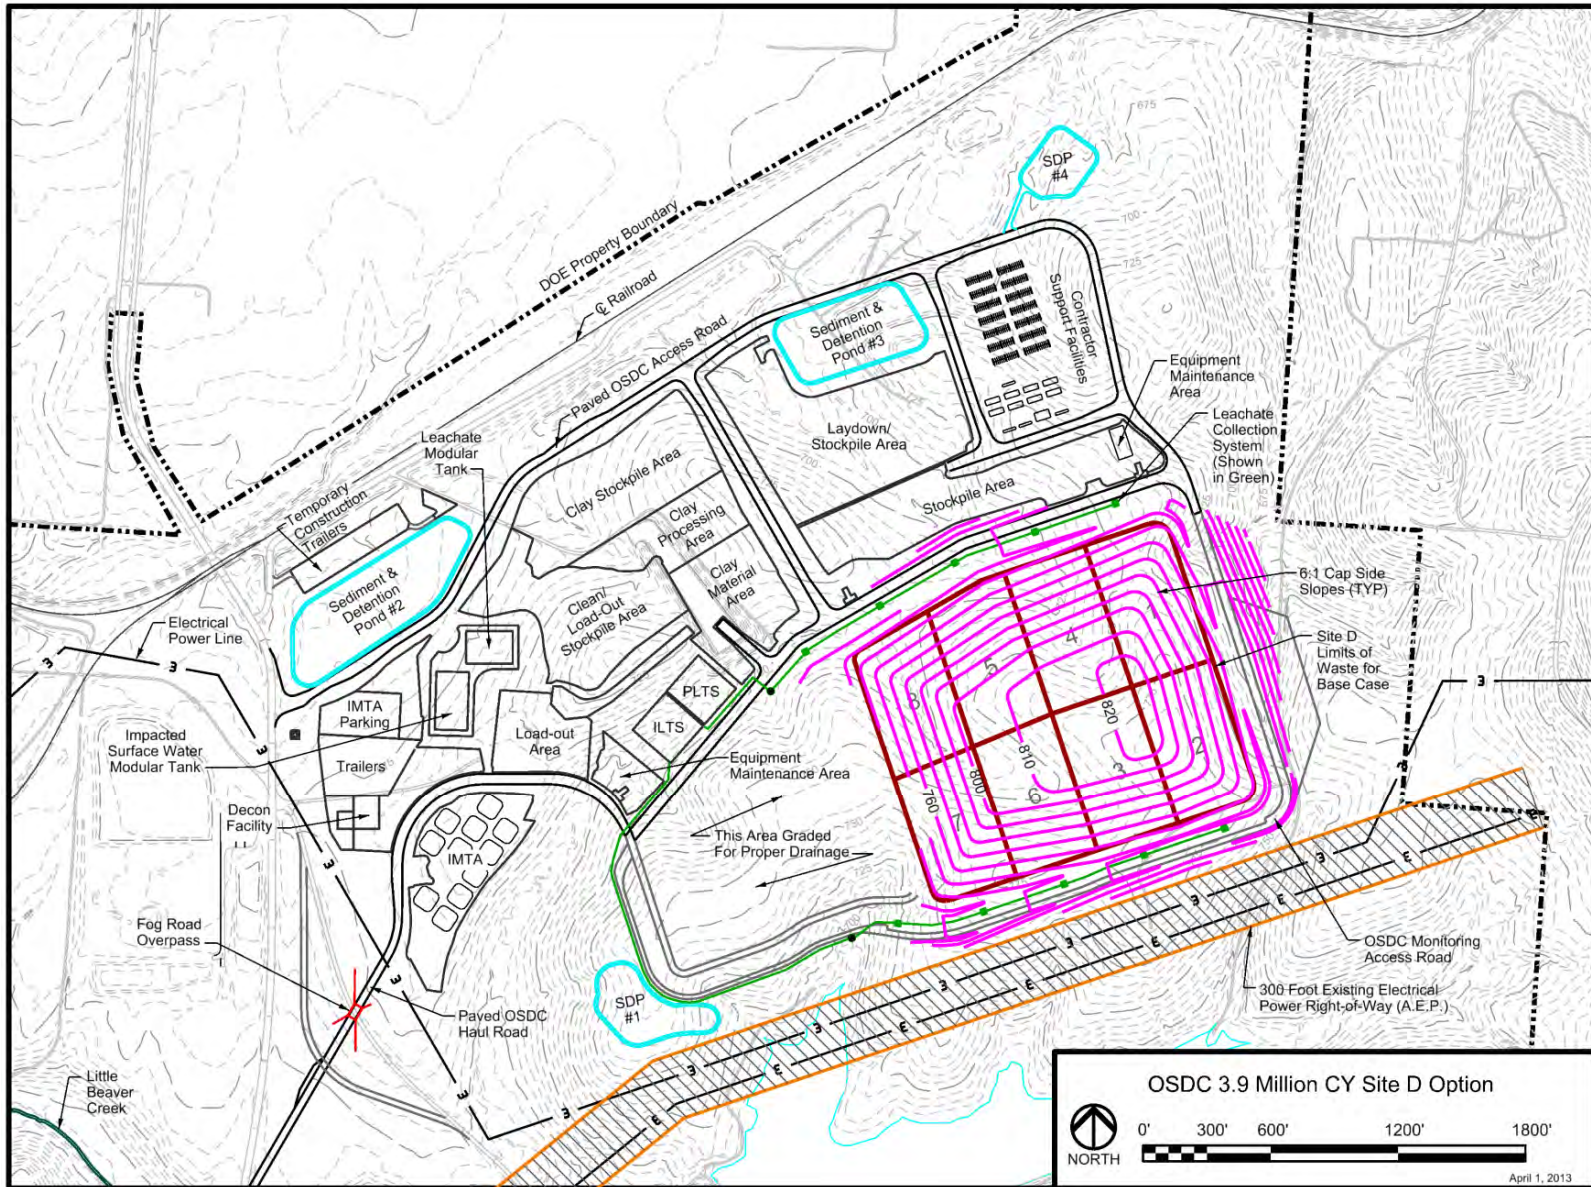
Landfill Plan View – Finished Grading Plan for Study Area D at PORTS
